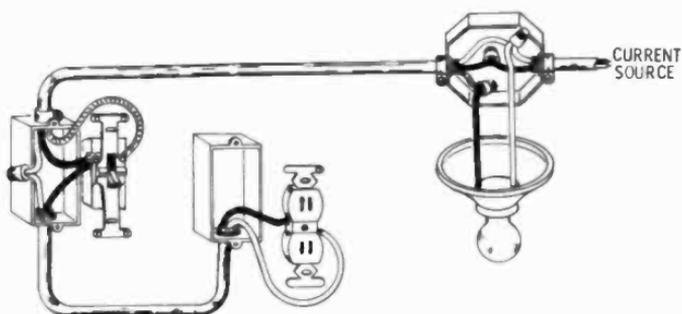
Wiring system when the feed line comes into the ceiling fixture box. Note the three wires from the fixture to the switch. If the feed line comes into the outlet box, only two wires would be needed between switch and fixture.
